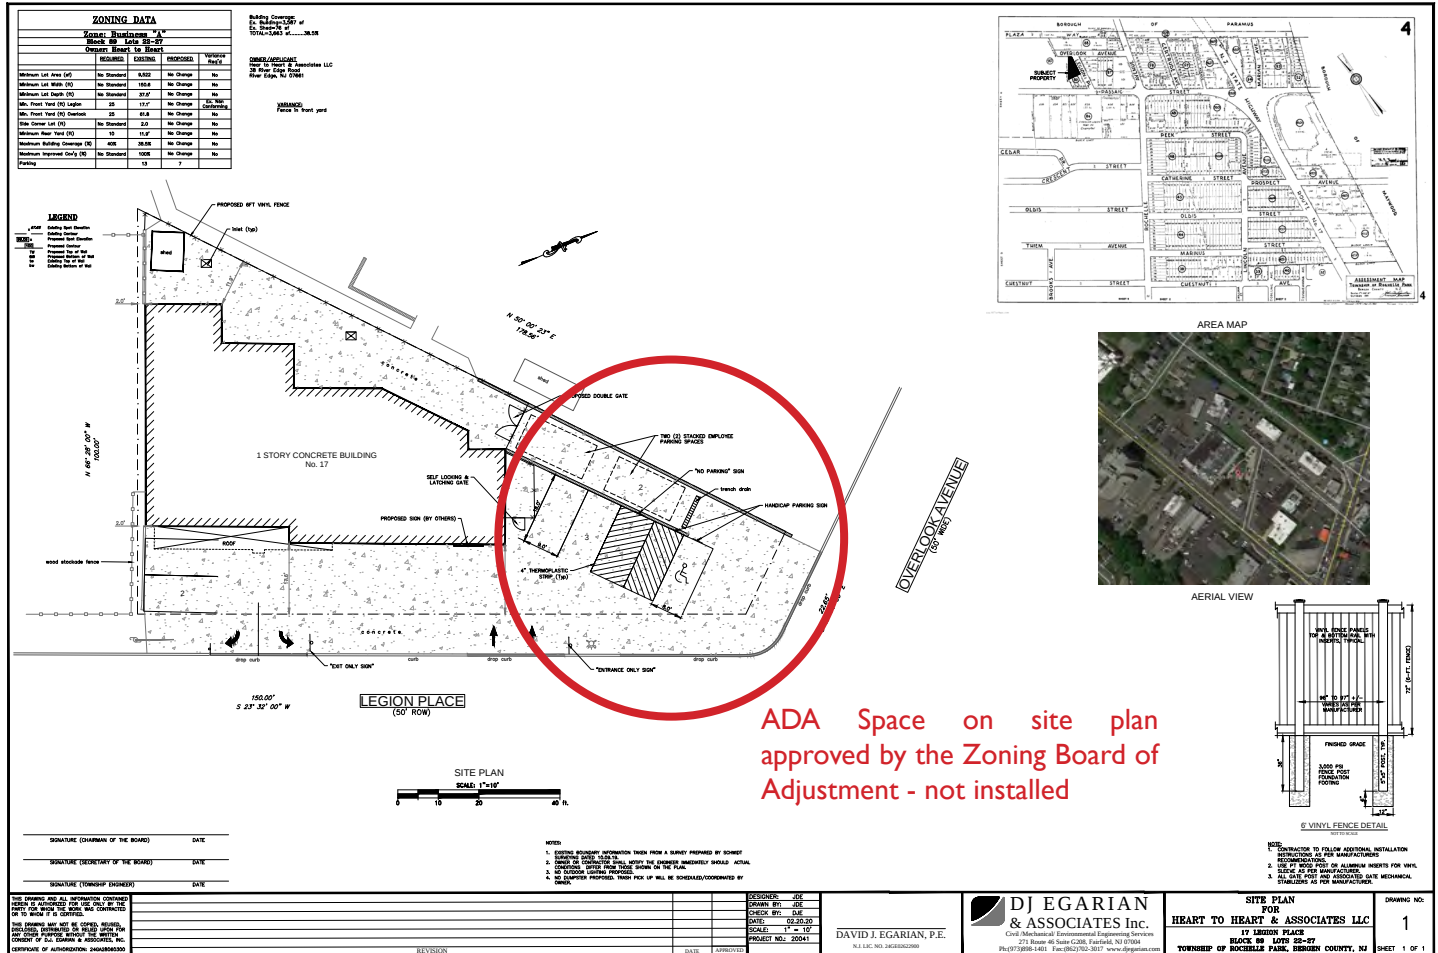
SITE PLAN APPROVED BY ZONING BOARD OF ADJUSTMENT
